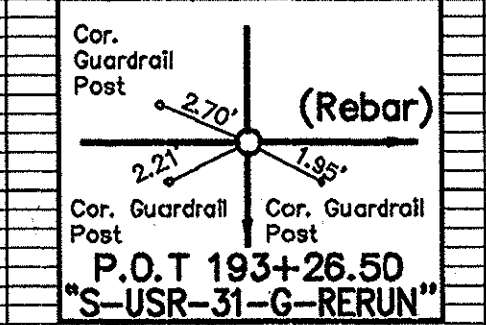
PLAN - PROFILE B. M. WOOD 1975
